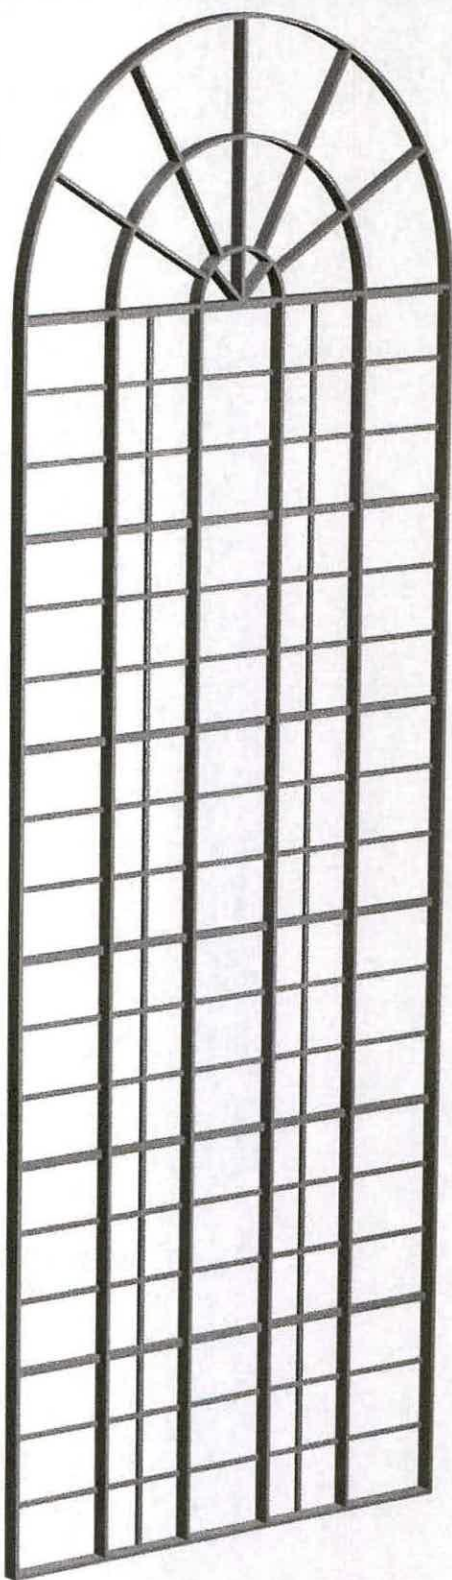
, a perspective reconstruction drawing, showing the framework of the standard window ferramenta, as it would appear stripped of glazing, casements, security bars and modern grilles.
